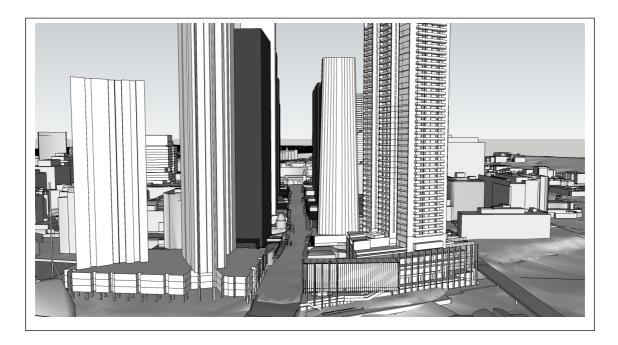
10m upper level (tower) setback - looking south towards St Johns Church
